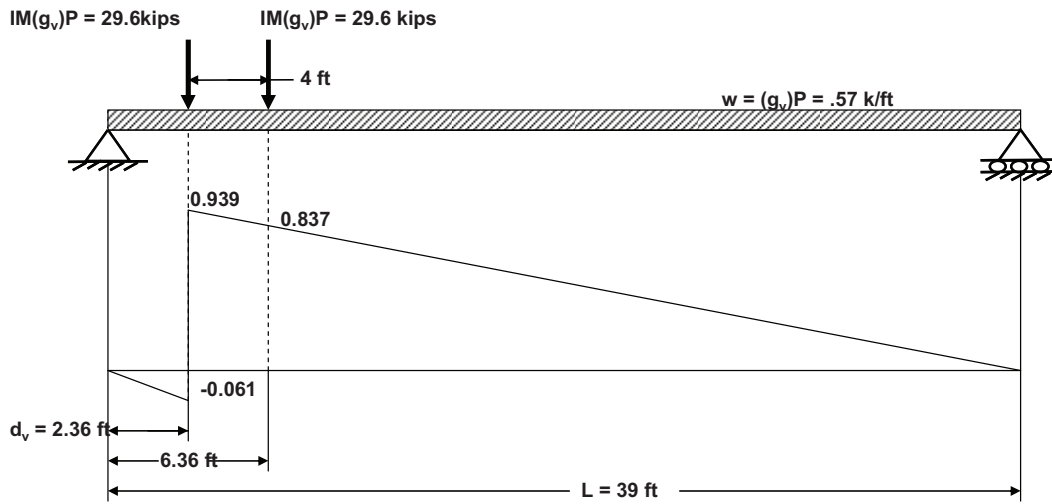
Interior Beam Shear Design Tandem at  $d_v$
